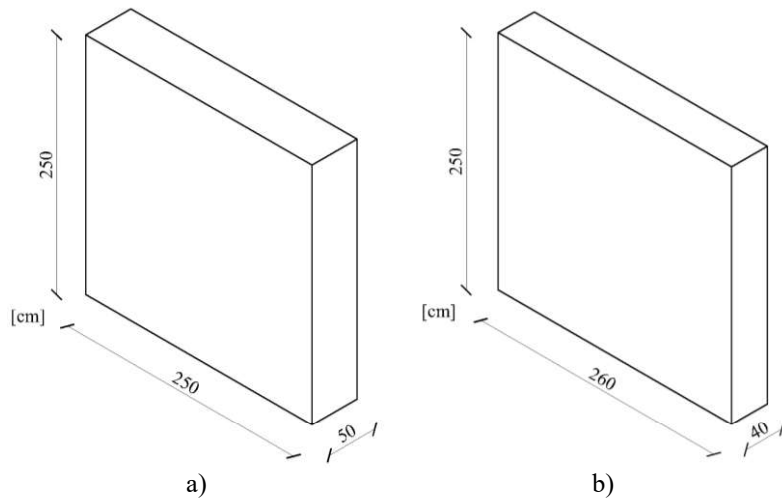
Dimensions of the walls: a) wall W-50, b) wall W-40
